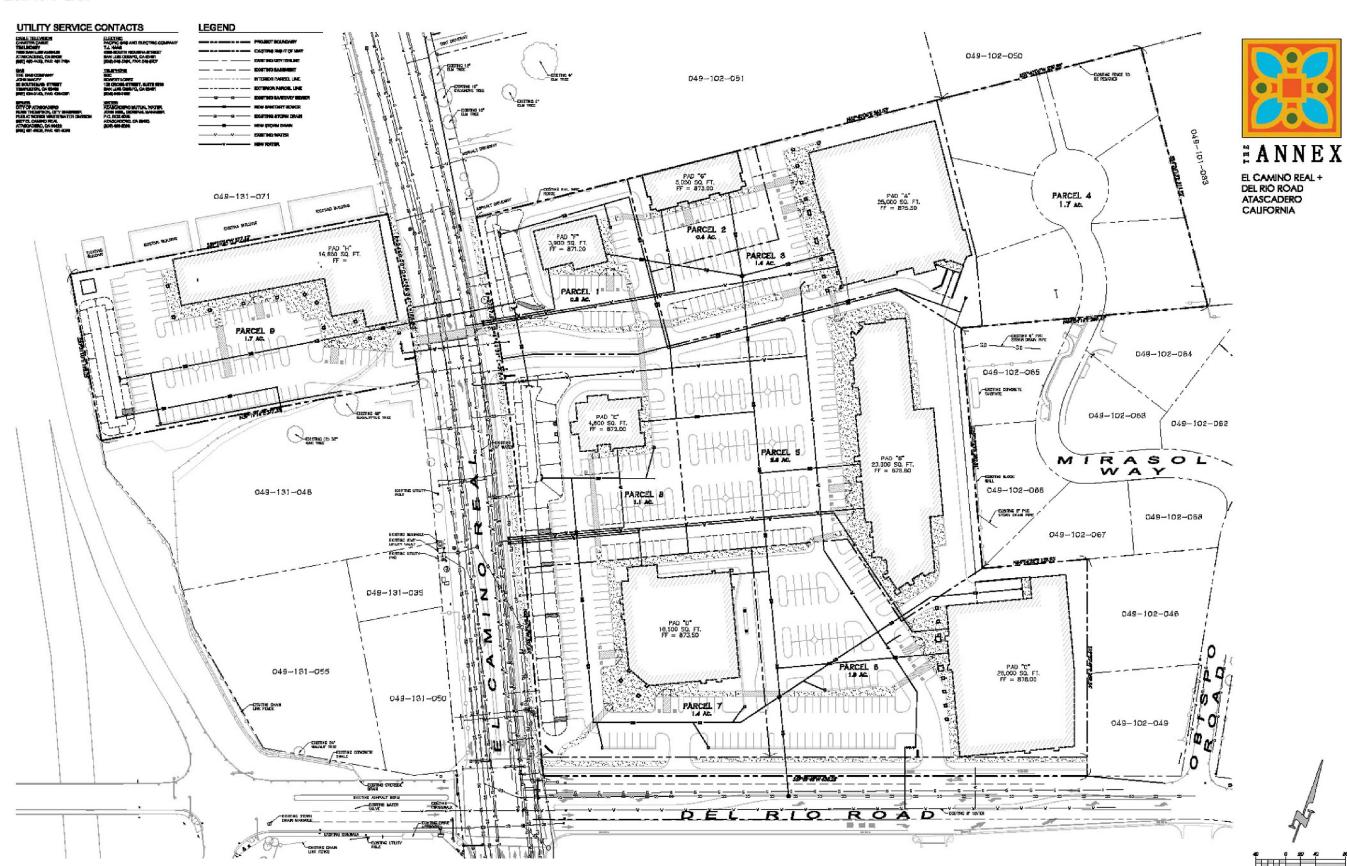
MAJOR TENANT PROJECT SITE PRELIMINARY GRADING PLAN
